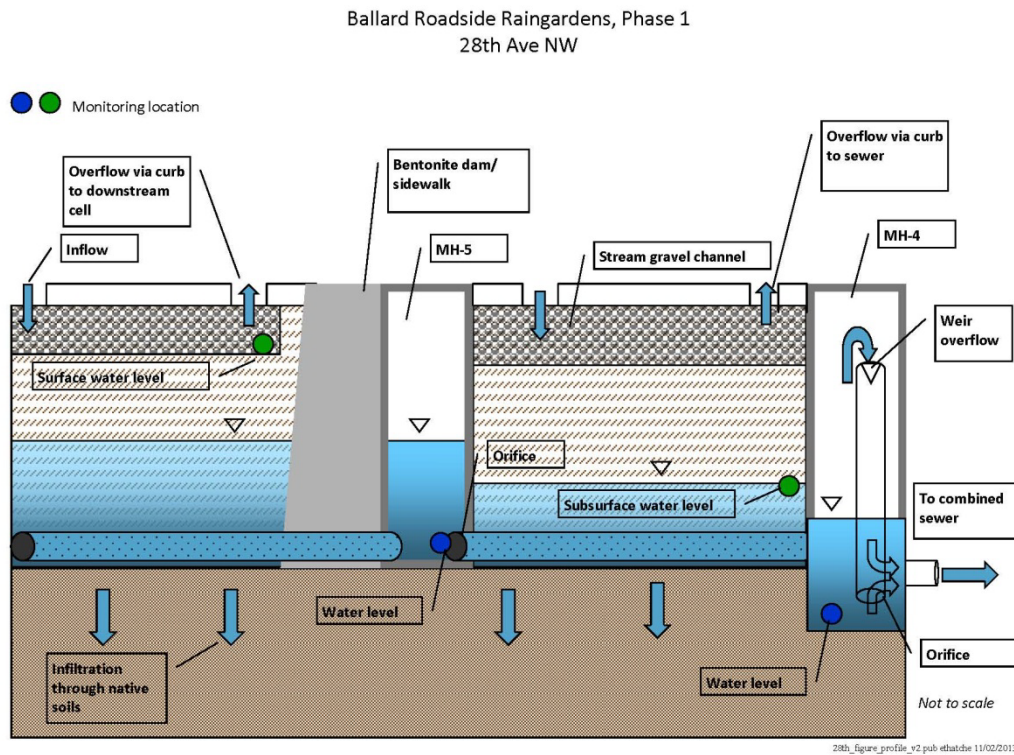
28th Avenue Raingarden Cross-Section, with Monitoring Points
